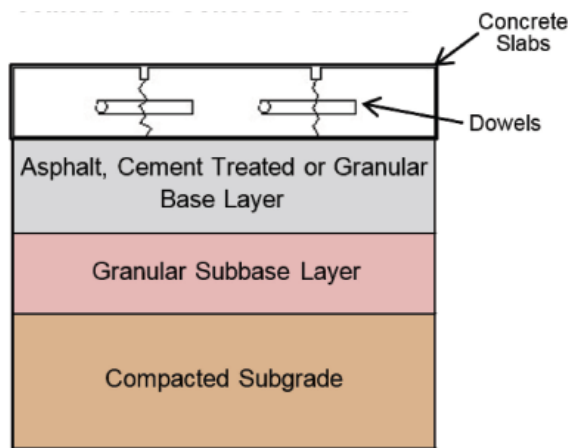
Jointed plain concrete pavement (Not to scale) (T. J. Van Dam et al., 2015, p. 4.13)
